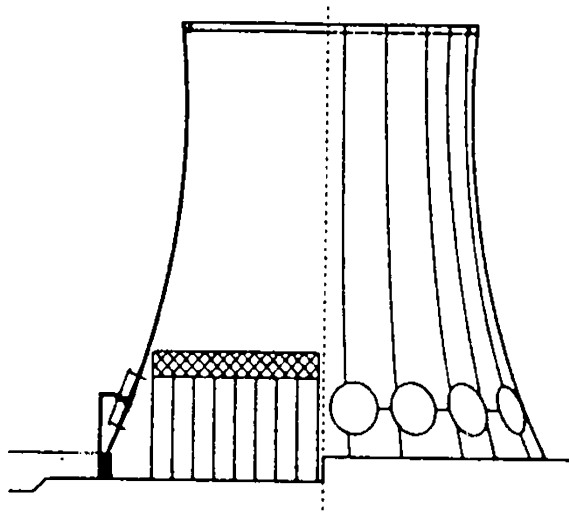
Mechanical draught cooling tower (pressure fans)
